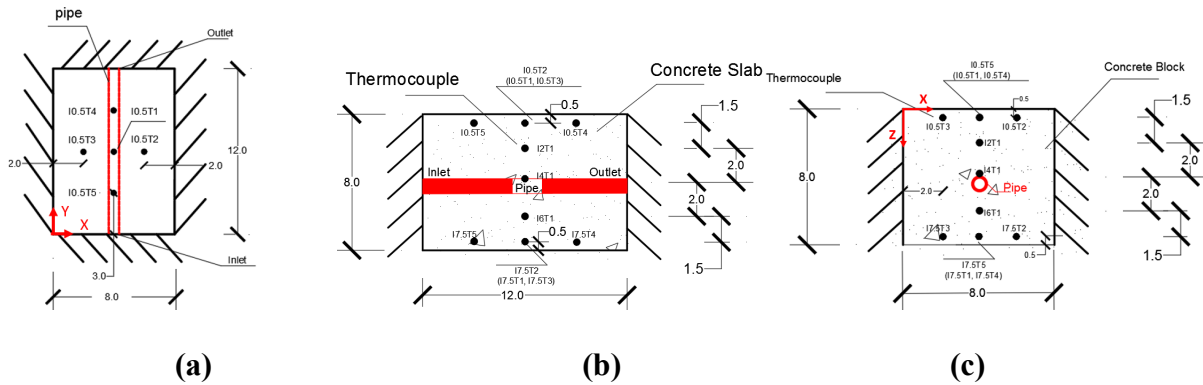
Thermocouple layout within the internally heated concrete and geofoam blocks: (a) top view, (b) side view, (c) cross-sectional view (unit: inch; 1" = 2.54 cm)
